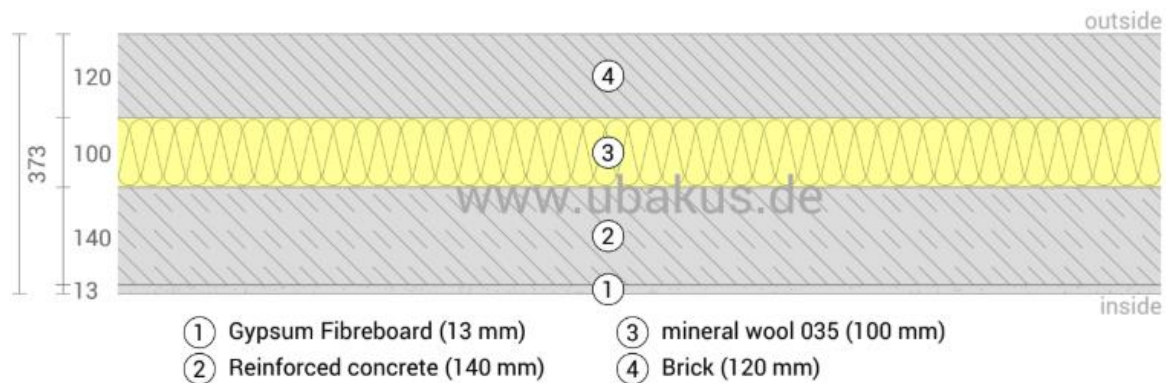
The construction assemblies of the existing reinforced wall of the apartment floor
